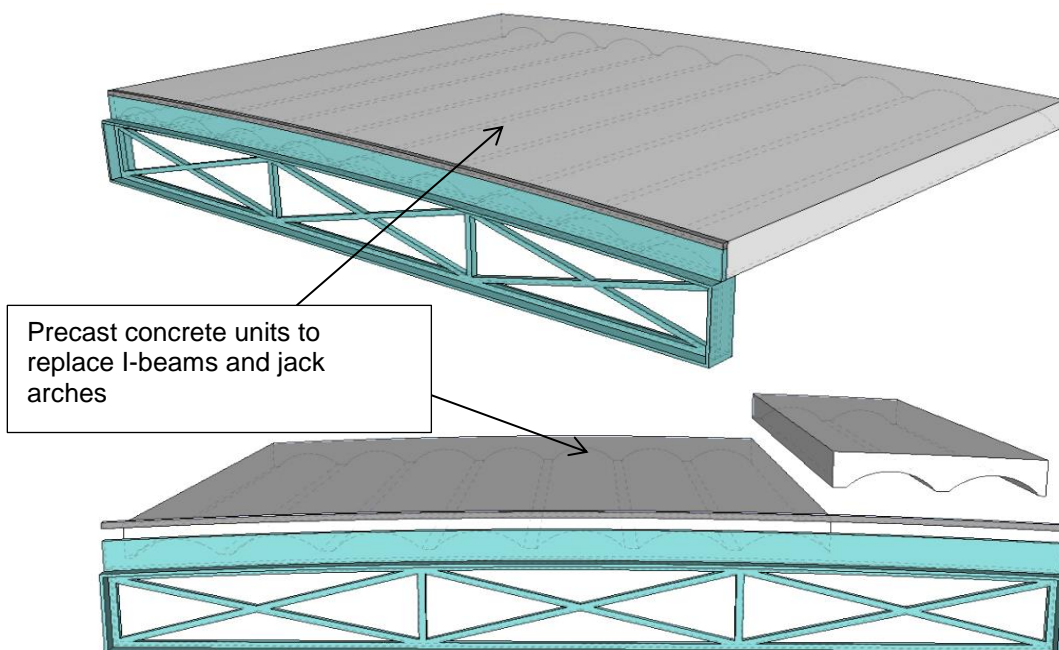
Steel I-beam and in-situ jack arch replacement
